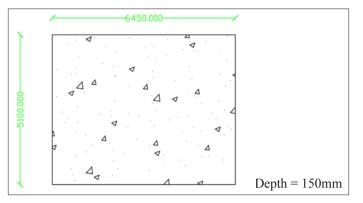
showing dimension of concrete slab in millimetre (mm). Source: Author's archive, 2019.
